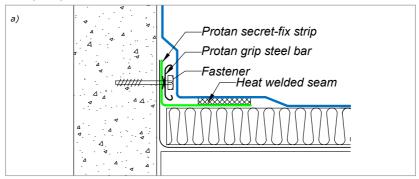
Parapet skirt of Protan roofing membrane with a secret fix strip welded on for Protan grip steel bar fixed to the parapet.
